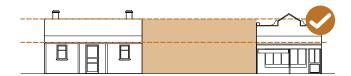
New building with facade height that is consistent with adjoining contributory buildings.
